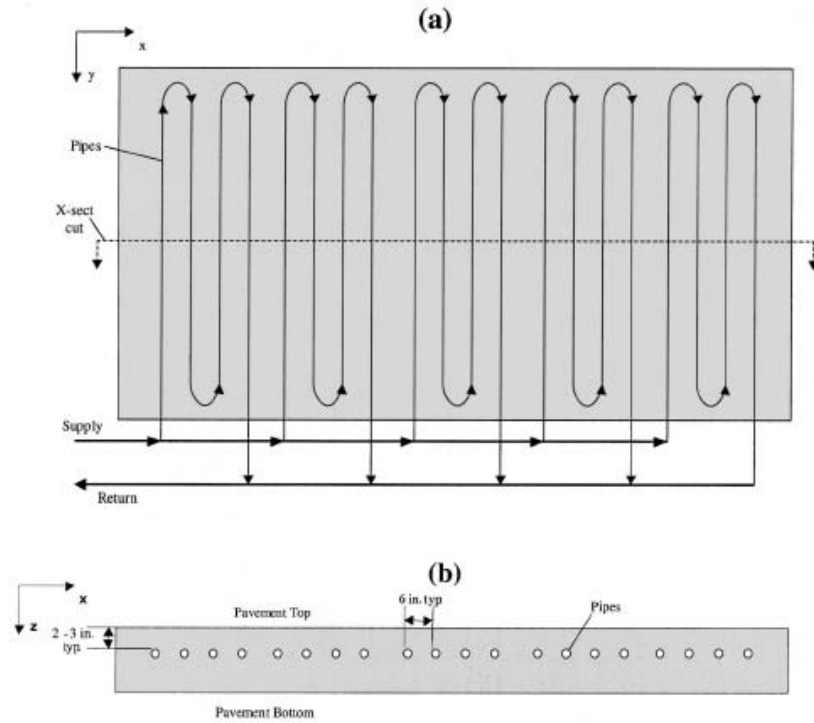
Serpentine pipe configuration in a hydronically-heated pavement slab in (a) plan view and (b) cross-sectional view
